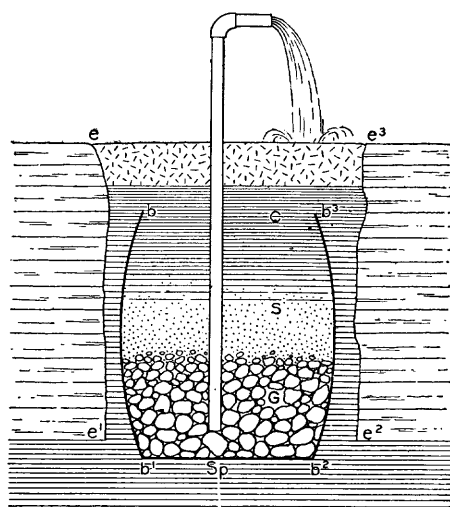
Diagram showing method of constructing a "fountain spring." Sp. point of emergence of spring; G, gravel; S, sand; C, clay;  $b\ b^1\ b^2\ b^3$ , sunken barrel;  $e\ e^1\ e^2\ e^3$ , outline of original excavation.
